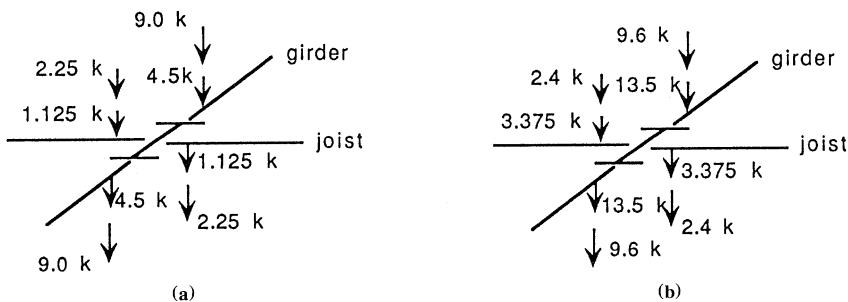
Loads on a typical interior column. (a) Roof loads. (b) Floor loads.
